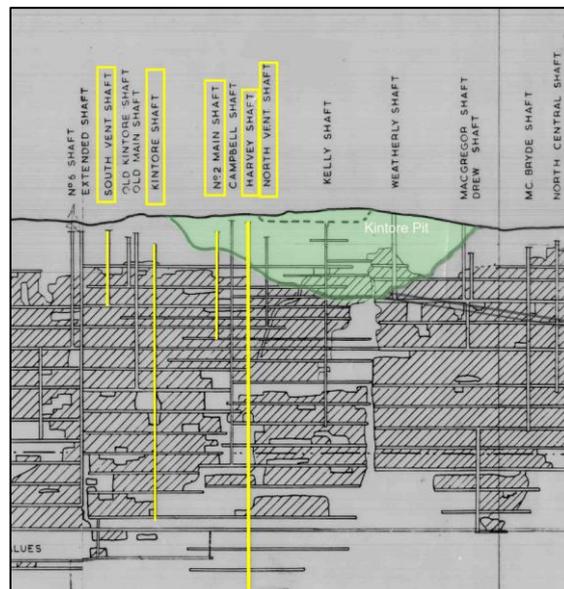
Section View, Intact hangingwall and Footwall surface shaft collar Locations (looking W)
